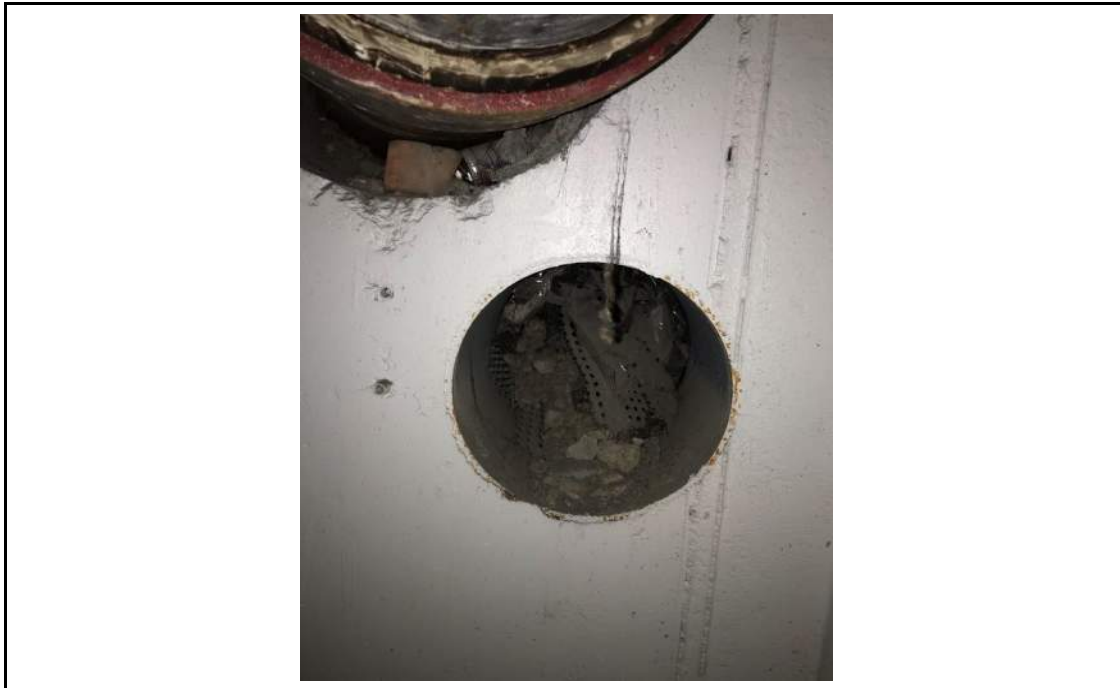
Hole observed in subgrade parking lot concrete foundation wall (beneath the first floor), facing south. 21 April 2021.
